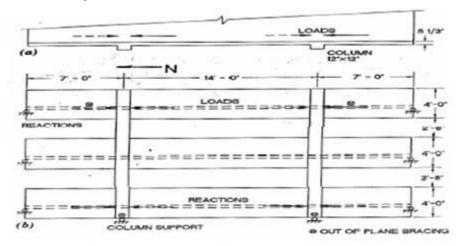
Schematic of 2 3 scaled frame model: (a) Plan, (b) Elevation. [3]
